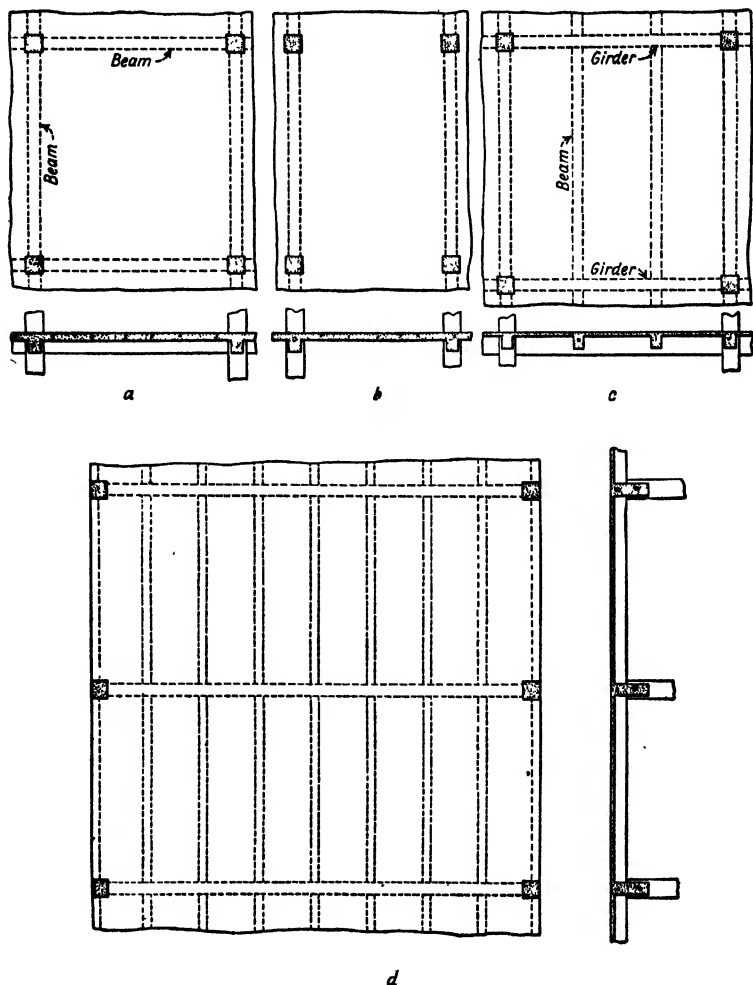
Arrangement of Beams and Girders. (See p. 578.)
